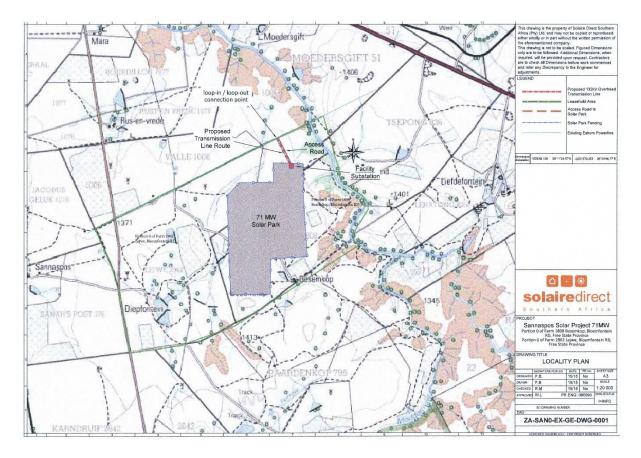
Site plan for the Sannaspos PV facility on Farms 1808 Besemkop and 2962 Lejwe.
